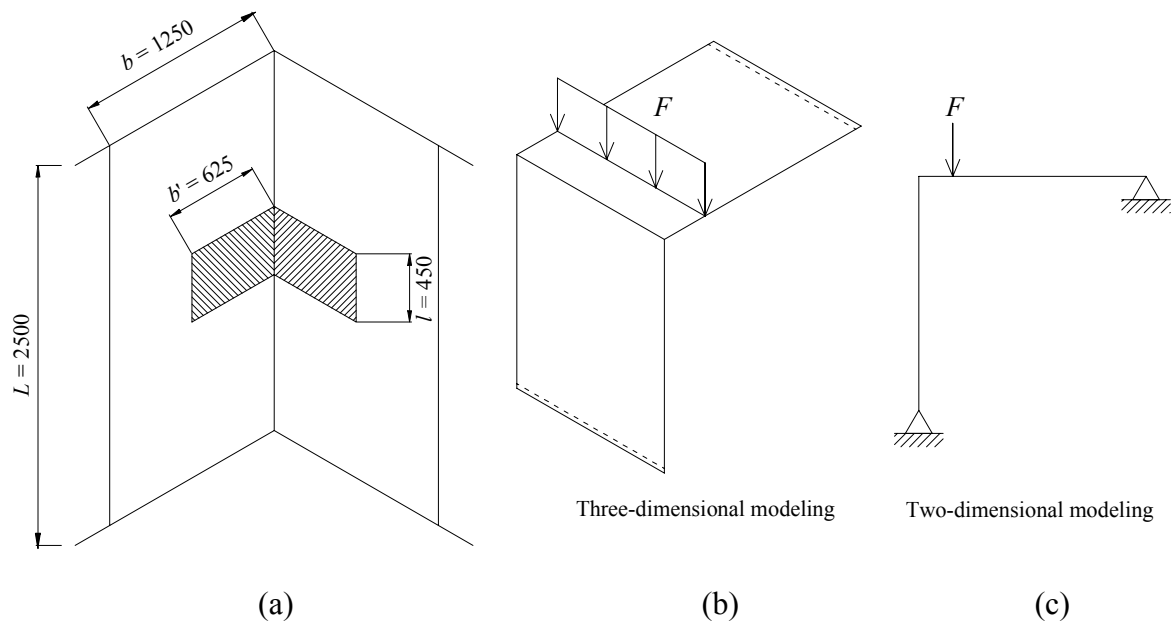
(a) Corner connection showing the part to be modeled. (b) Three dimensional modeling of the corner connection. (c) Two dimensional modeling of the corner connection.
